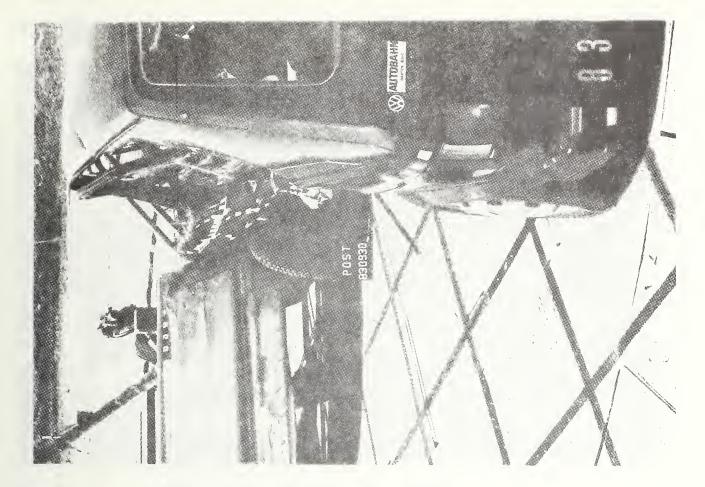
POST-TEST CLOSEUP - VIEW 1
